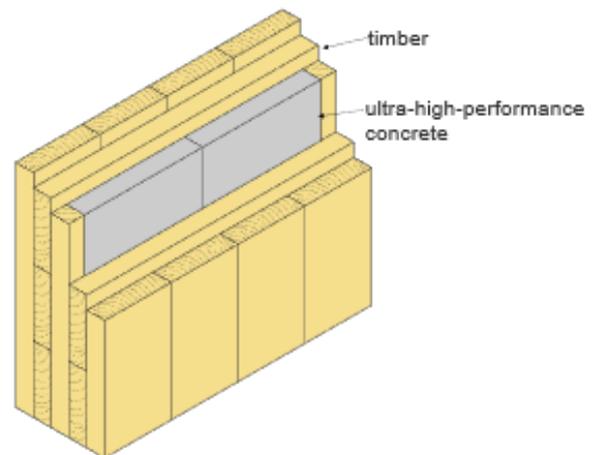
Wall with hybrid cross section comprised of timber and UHPC [5]
